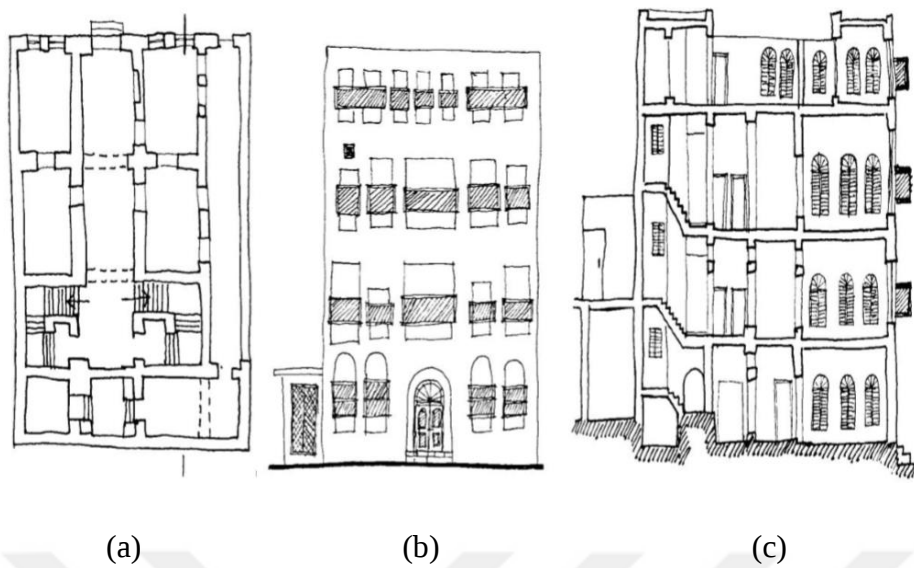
Ground floor plan (a), elevation (b) and section (c) of a typical traditional house in Jeddah (Talib,1984).
